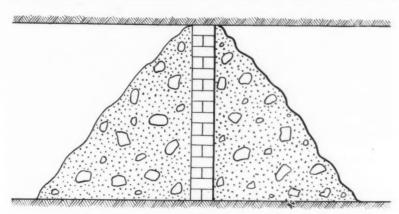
Elevation View of Poor Stopping. Brick and Both Sides Backed by Refuse. Brick Not Recessed
